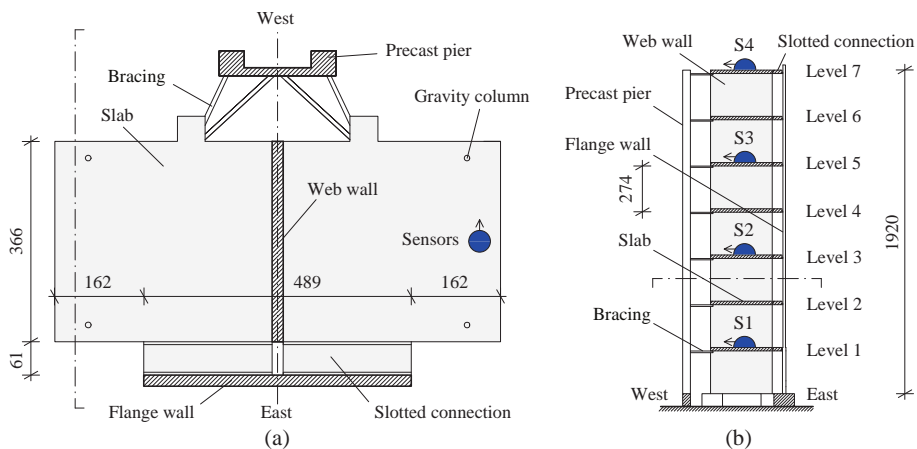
Scheme of the RC building: plan view (a) and vertical section (b)
